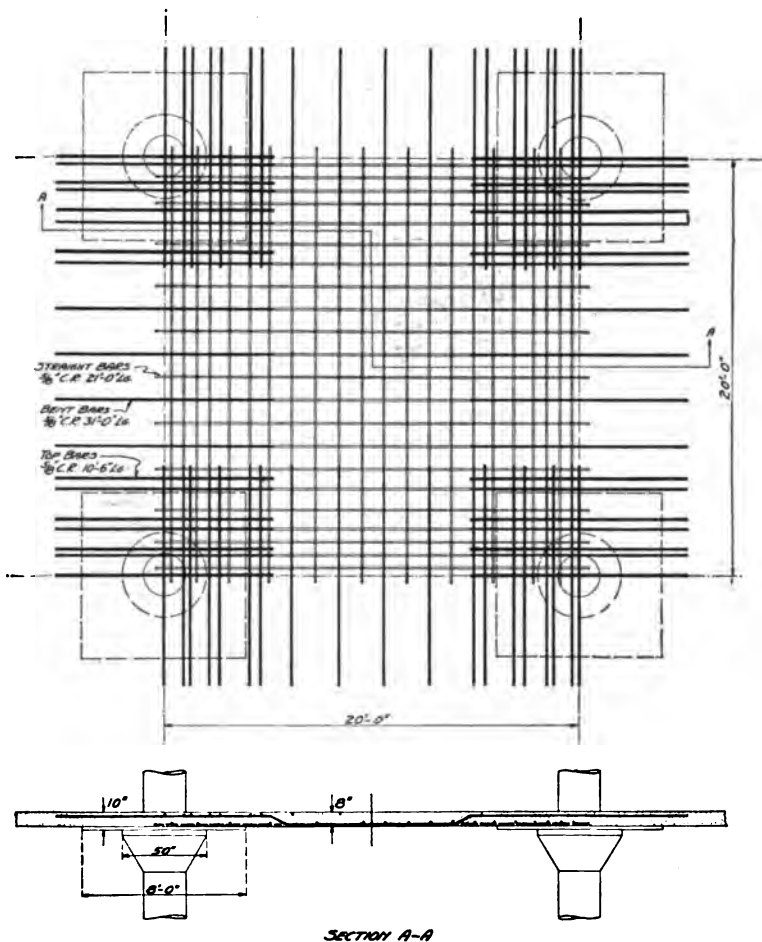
ARRANGEMENT OF REINFORCEMENT IN TYPICAL PANEL.
